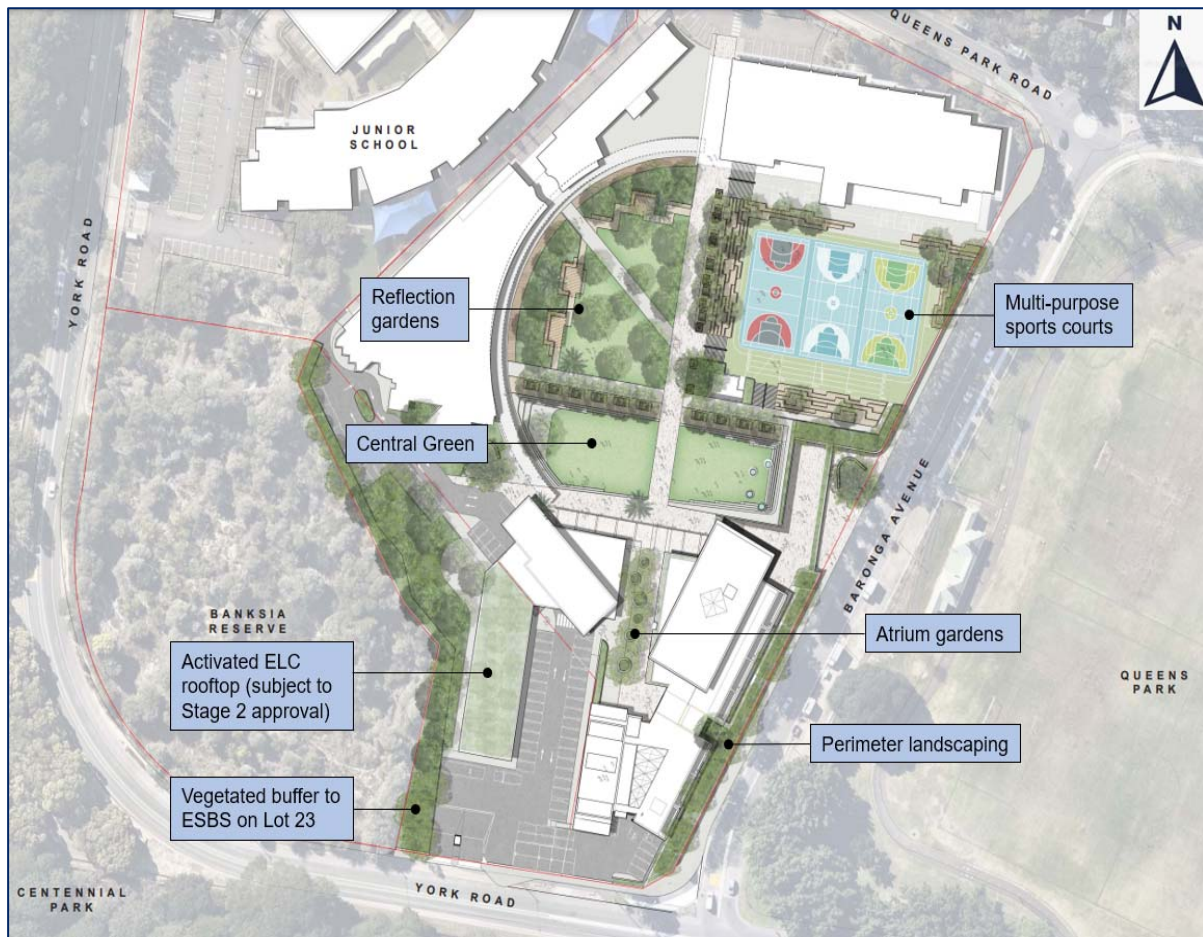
| Landscape master plan (Source: Applicant's SRtS)
